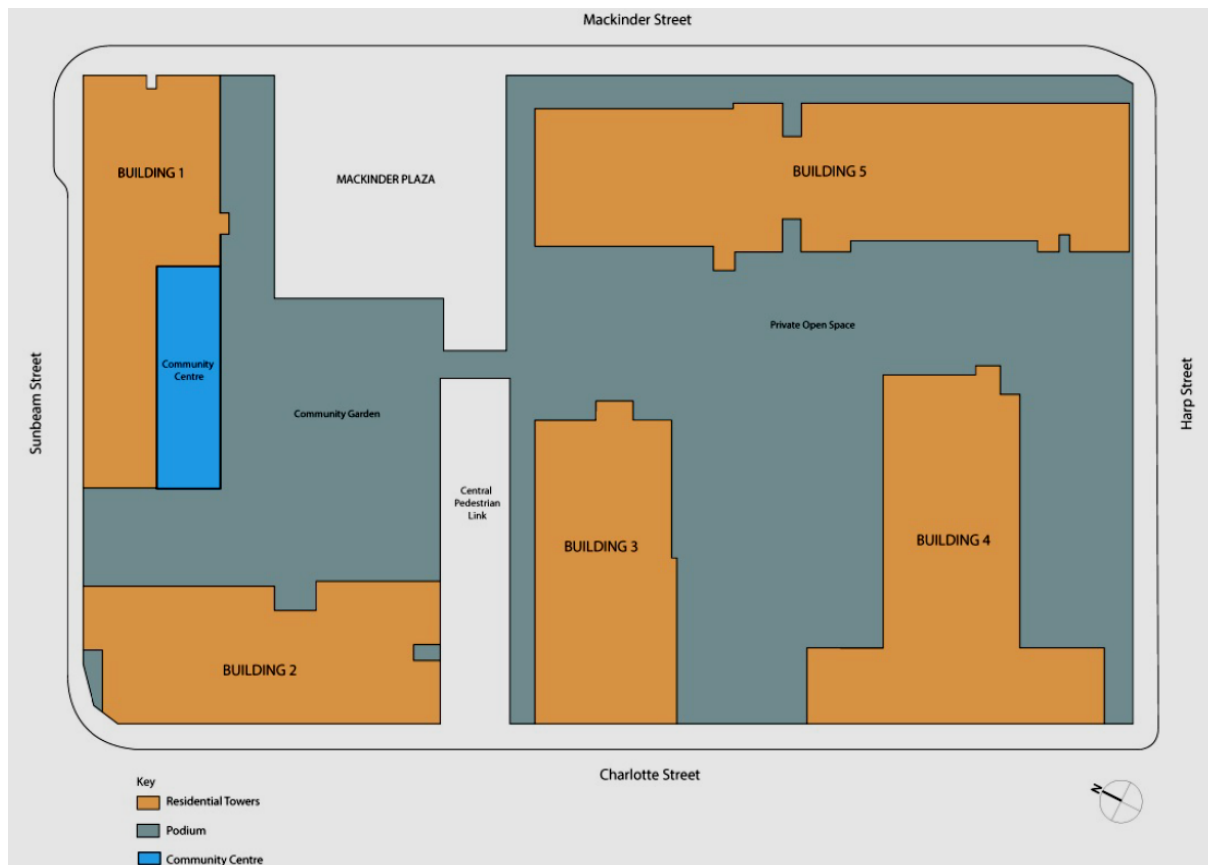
Proposed Site Layout Plan. Source: *Stage 3 – Clemton Park Village – Statement of Environmental Effects*, p. 15.
